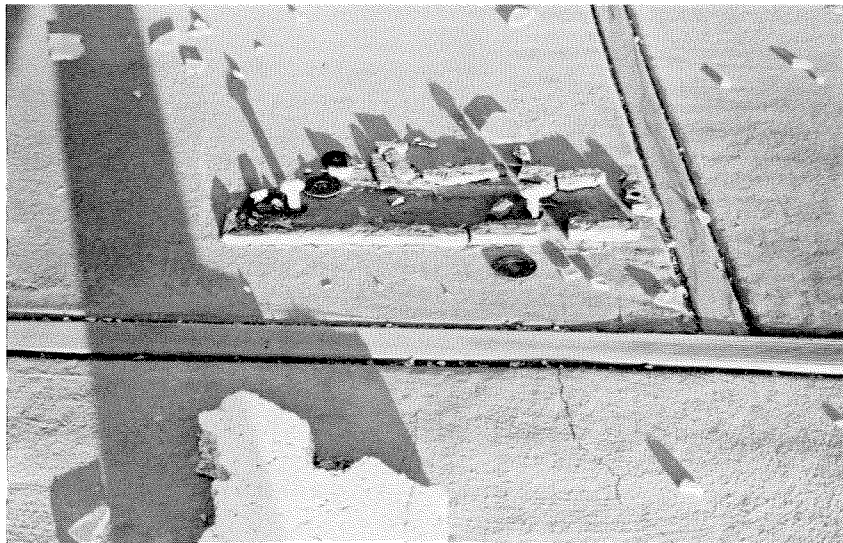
Details of mounts for overturned concrete benches, Olive View Hospital.
